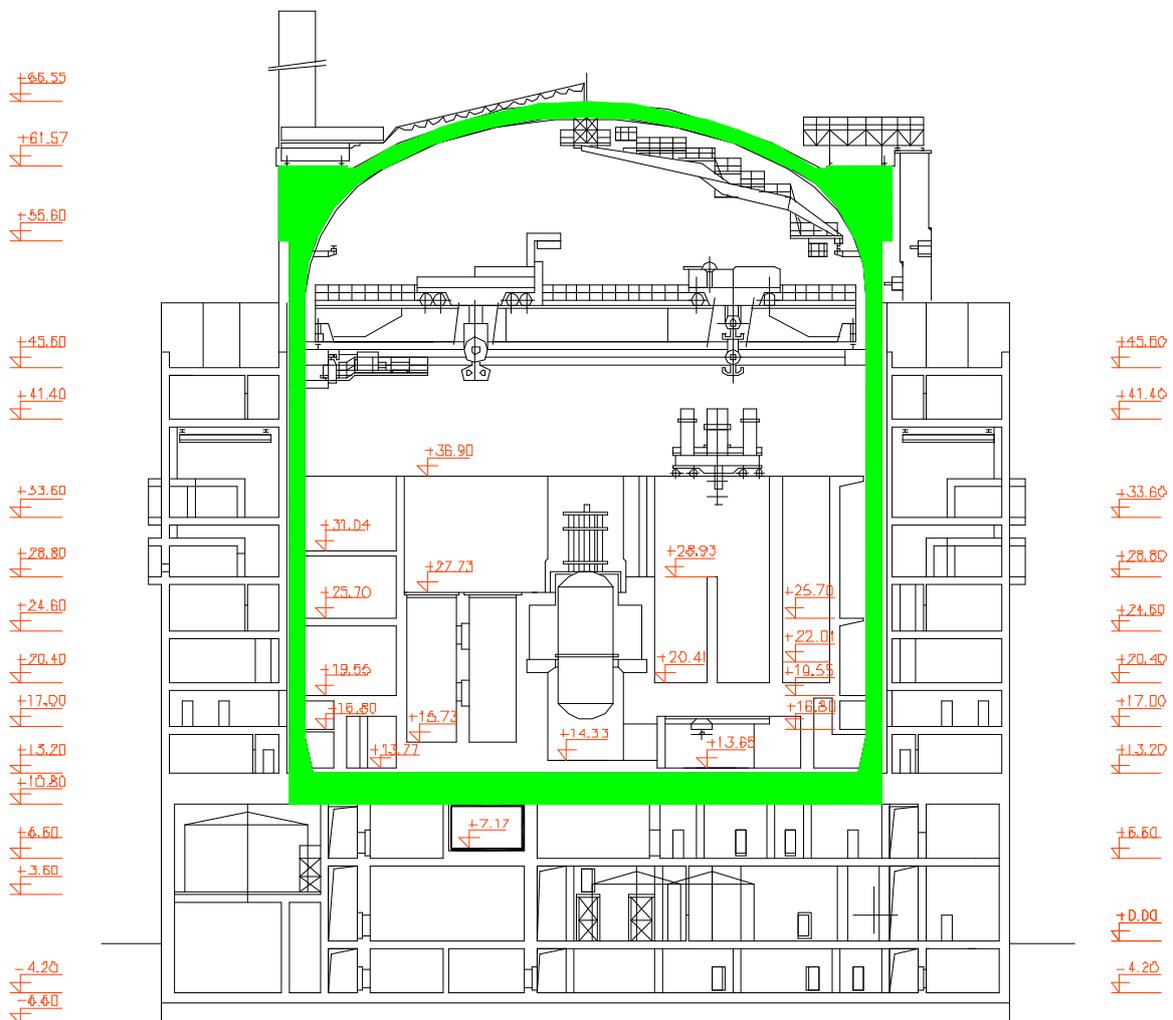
Section view of VVER1000 Reactor building, concrete containment is marked by green filling
